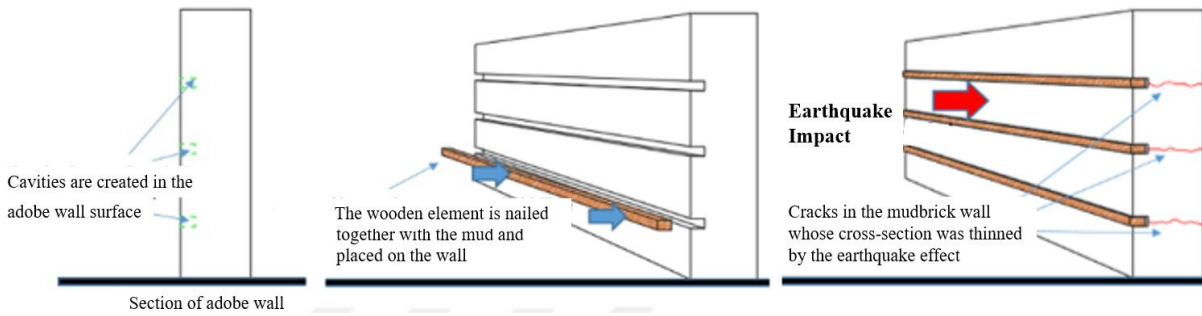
Extinguishing earthquake energy in an adobe wall as desired [1].
